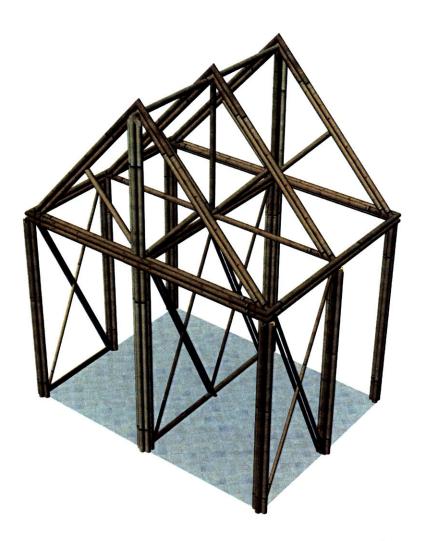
Beam-Column frame, Shear Walls and Roof
